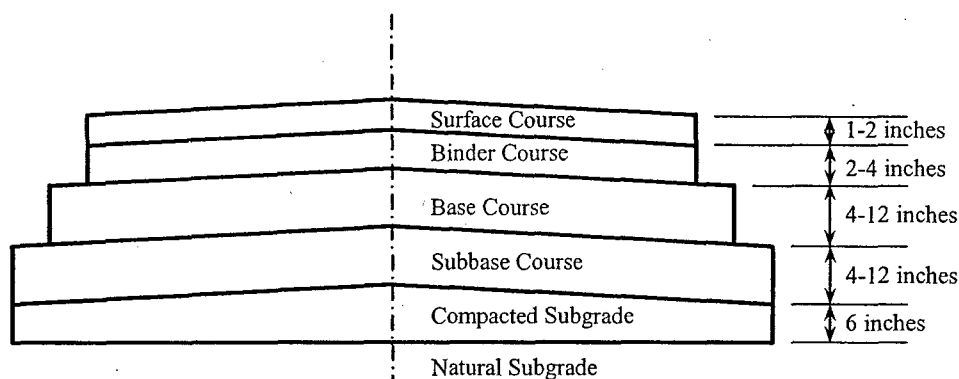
Typical Cross Section of a Conventional Flexible Pavement
